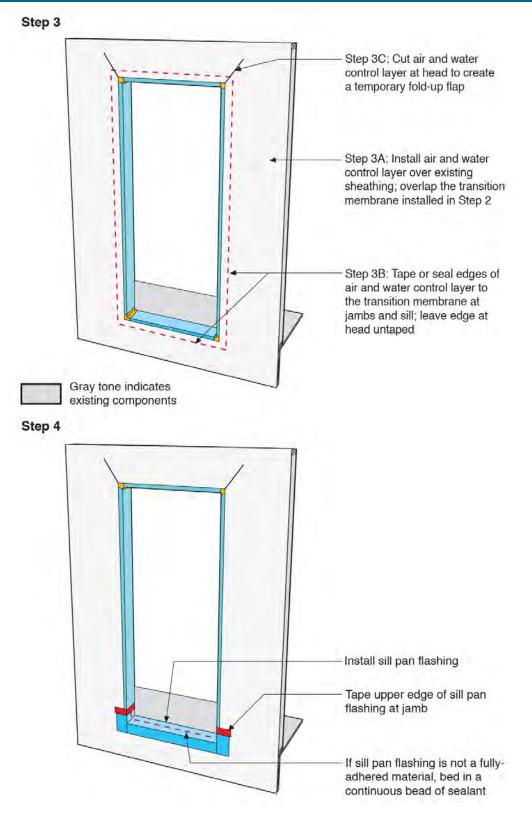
Steps 3 and 4 of installation sequence for new door or reinstalled door in a high performance mineral fiber retrofit wall assembly
